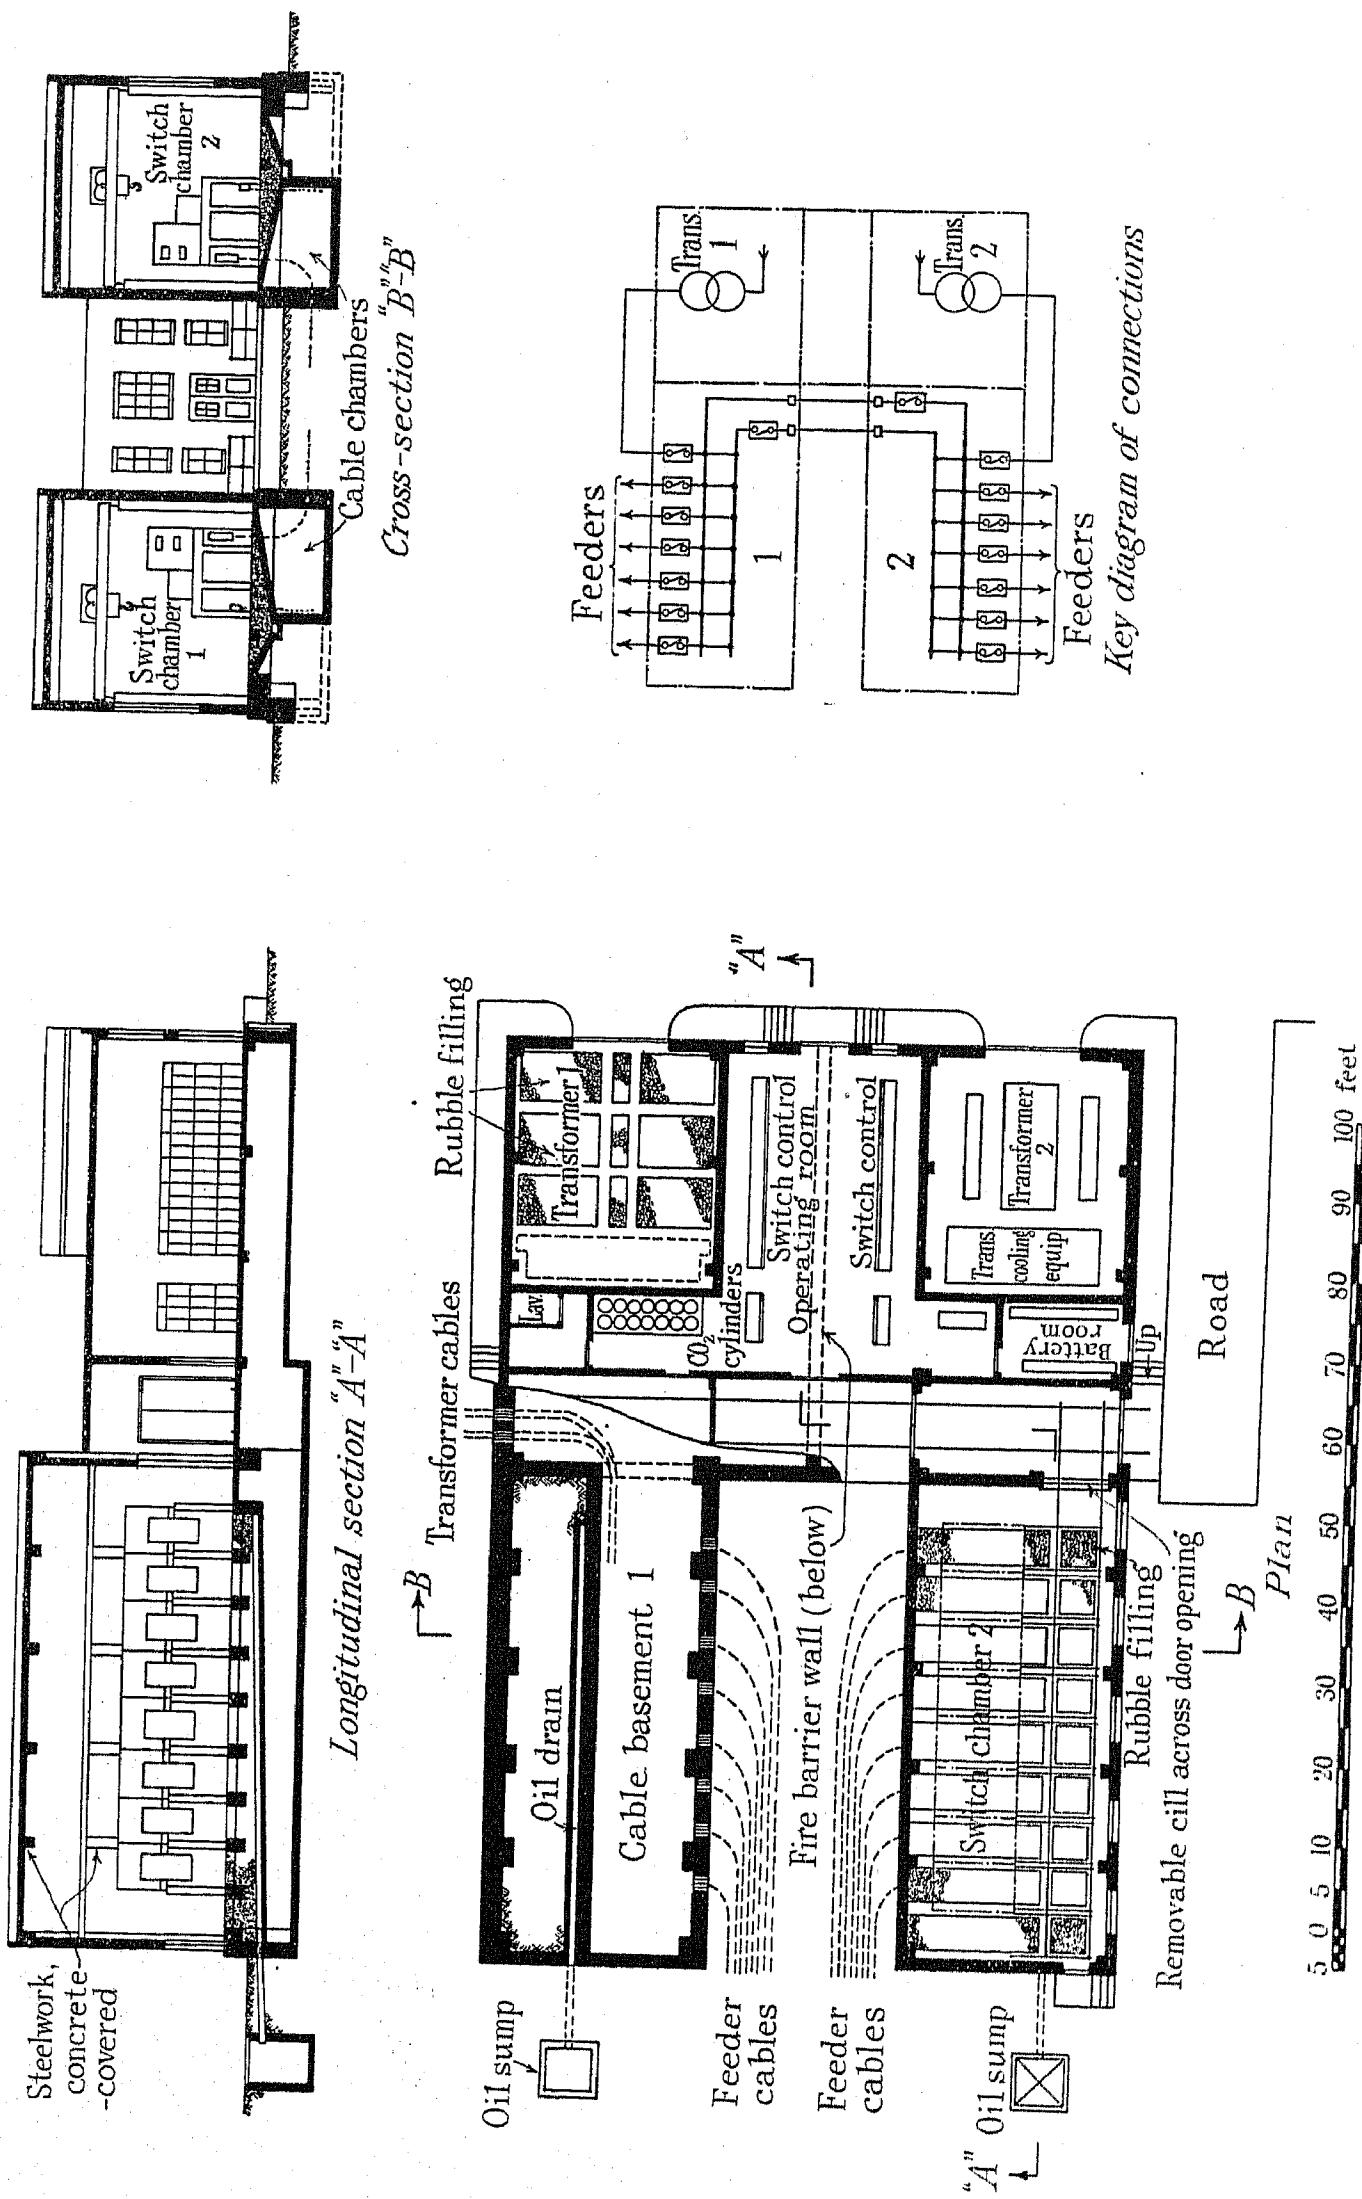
Typical arrangement of 33-kV substation using metalclad switchgear.
